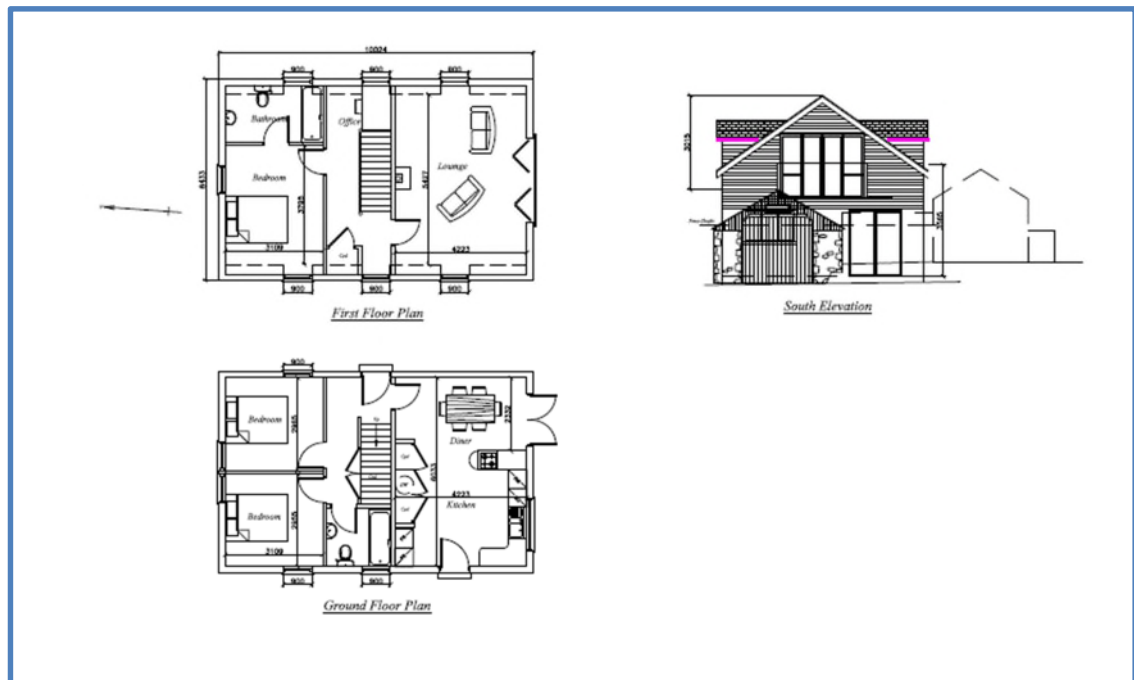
Proposed Plans Excerpt (extracted from submitted plans)
